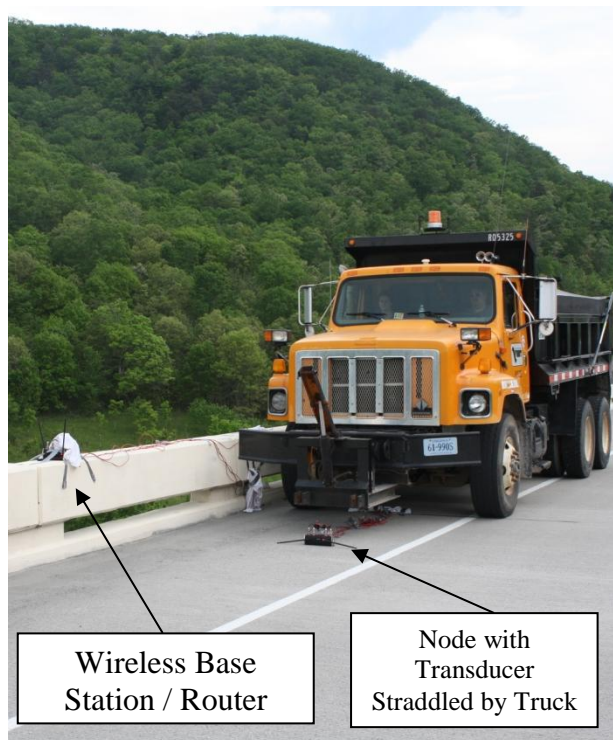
Strain Sensor on the Bridge Deck Straddled by the Load Truck
